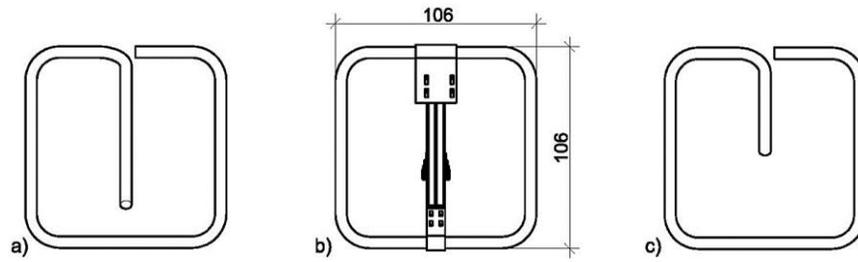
STAINLESS STEEL SPECIAL STIRRUP (DIMENSIONS IN MM)
